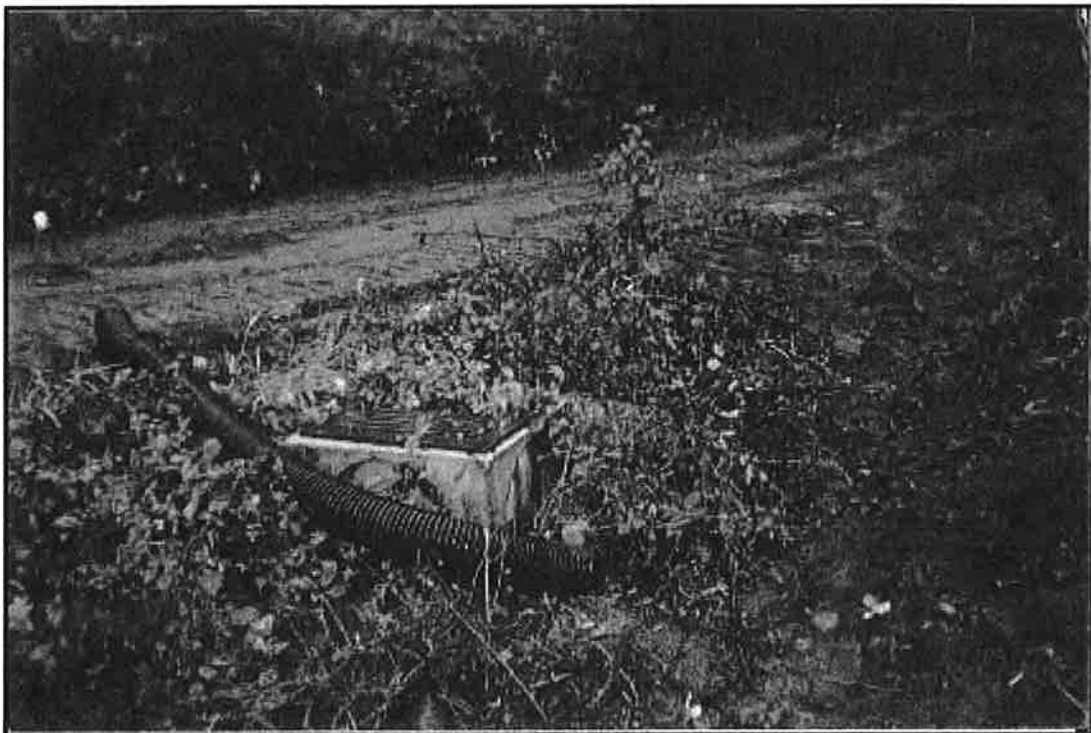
REPLACEMENT CULVERT UNDER 80TH STREET SW.
